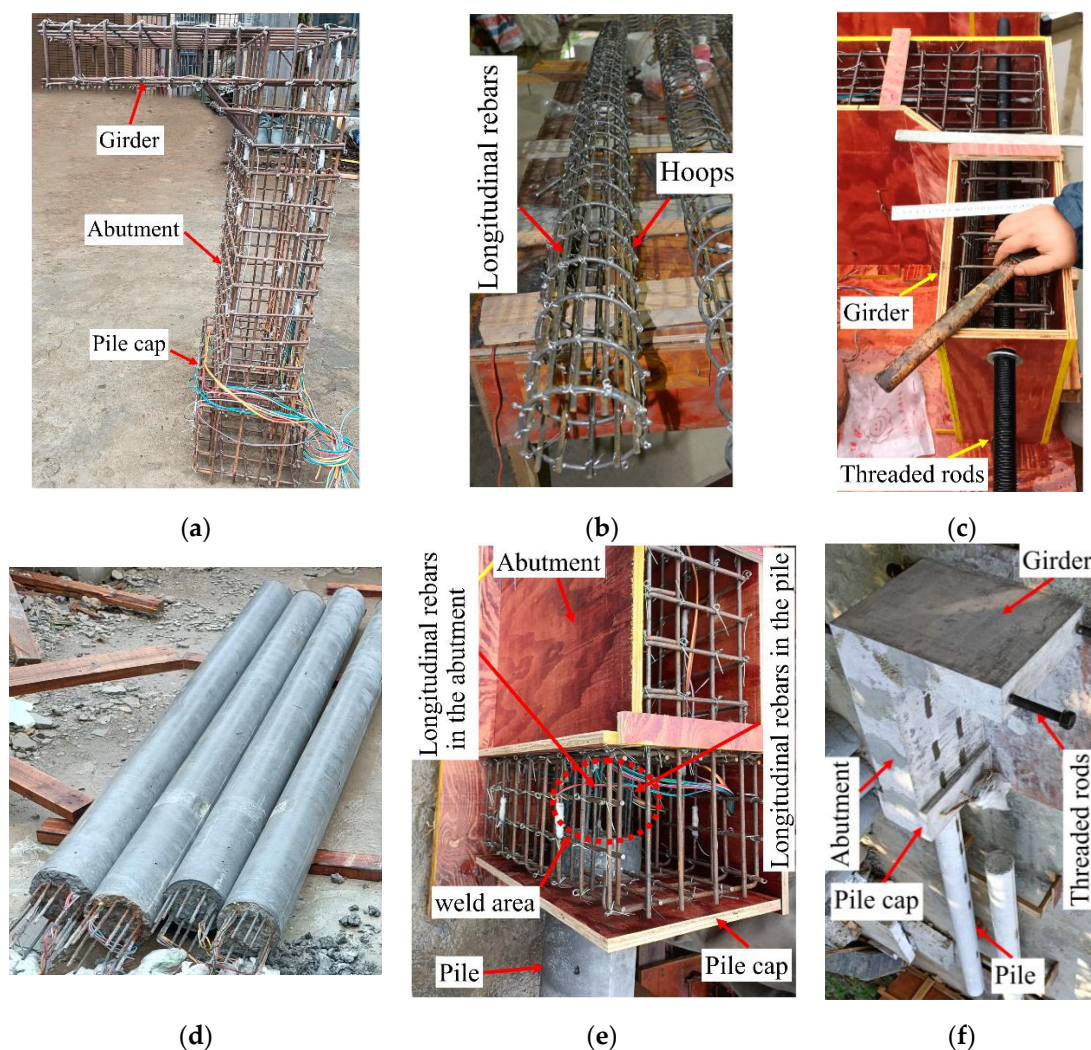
GIAP specimen fabrication: (a) rebar cages for the girder–integral abutment–pile cap connection; (b) rebar cages for the pile; (c) pre-embedded high-strength threaded rods in the girder; (d) pile specimen; (e) welded connection of rebars between the pile and pile cap; (f) girder–integral abutment–pile specimen.
